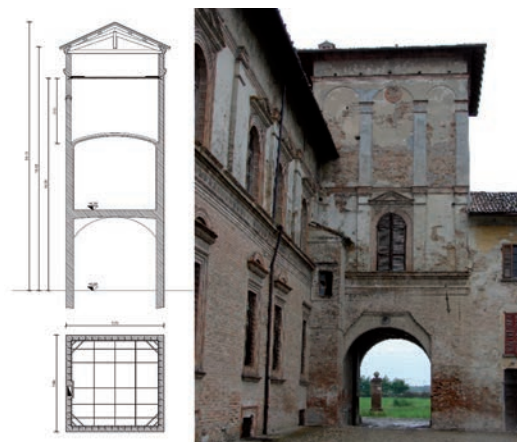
Above: vertical section of the tower; below: cross section and the structural interventions; right: the north tower.
